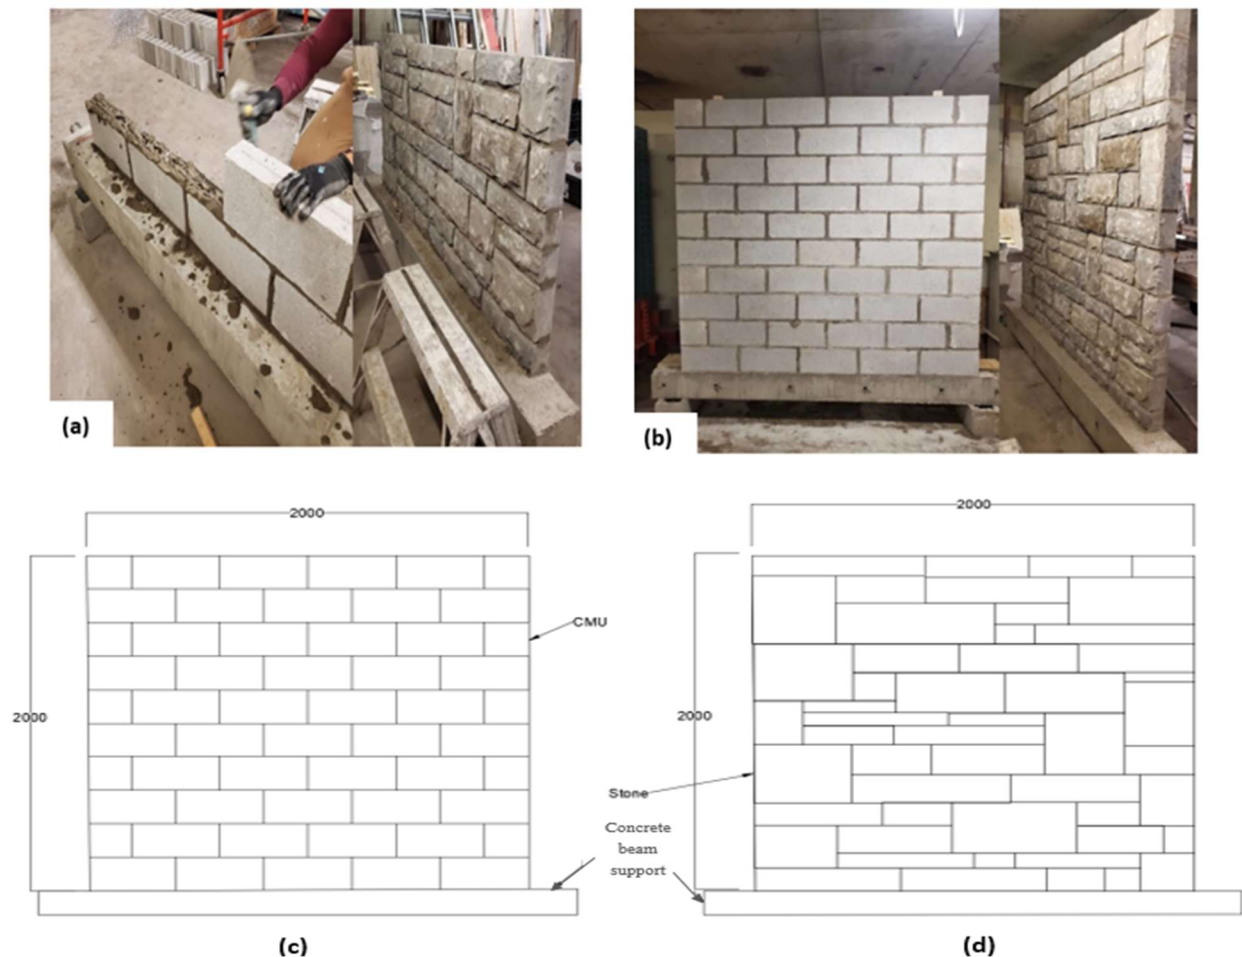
(a) Construction of CMU and stone wall in progress (b) Completely built CMU and stone walls (c) CMU wall with dimensions (d) Stone wall with dimensions
